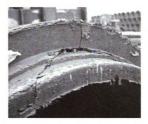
Crack Under Concentrated Load. Figure 3.34. Overall Crack View Under Concentrated Load.
